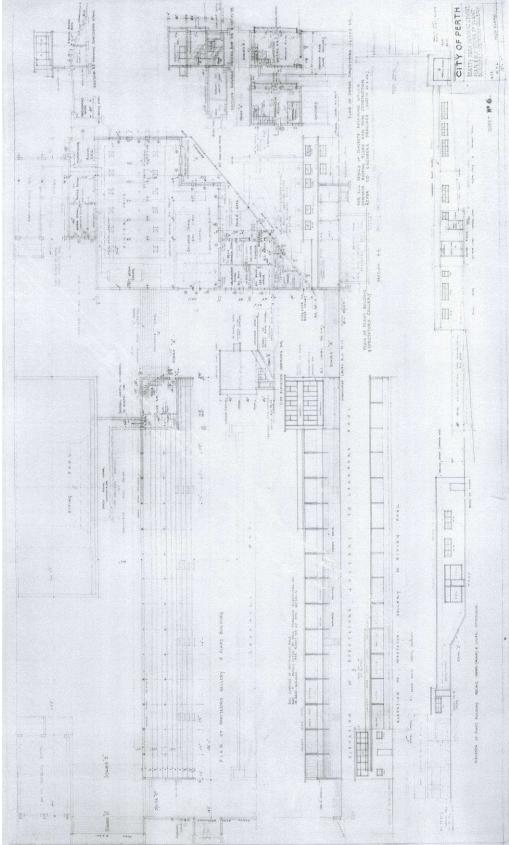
Plan & Elevations of Plant Building and Spectators' Gallery, City of Perth *Beatty Park Swimming Centre*, Sheet no. 6, 31 July 1961, SROWA Cons. 5094, Item 1837.
